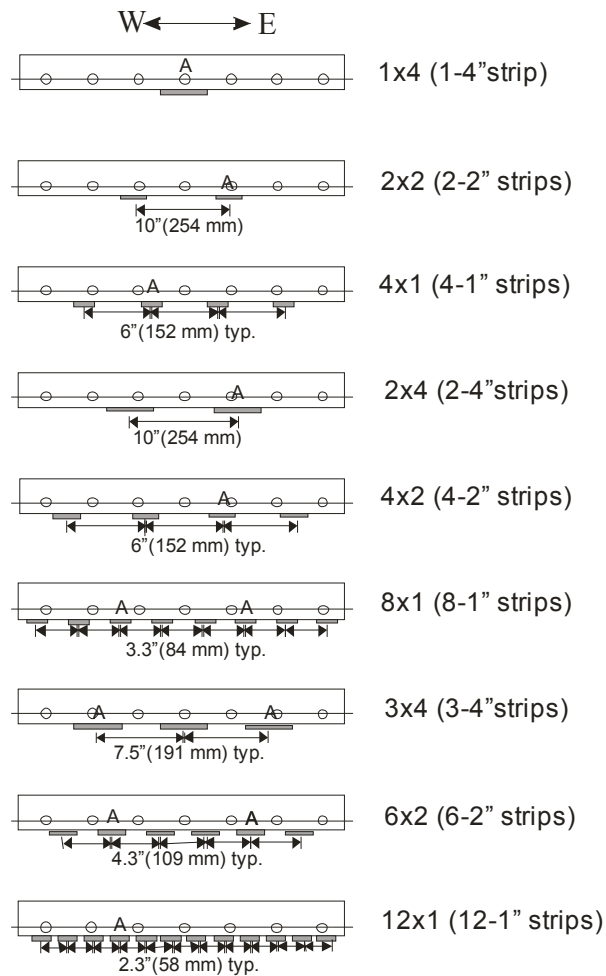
Cross section of the CFRP retrofitted slab specimens. (A – CFRP strip with AE sensors)
